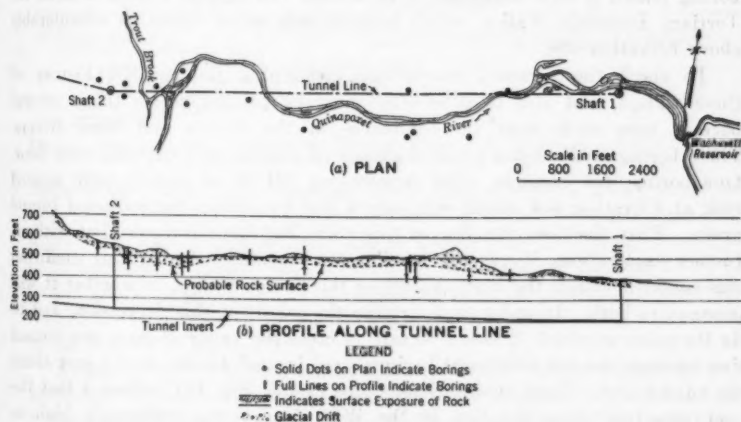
LOCATION OF BORINGS AND APPROXIMATE ROCK FLOOR ALONG TUNNEL LINE BETWEEN SHAFTS 1 AND 2, QUINAPOXET VALLEY.
